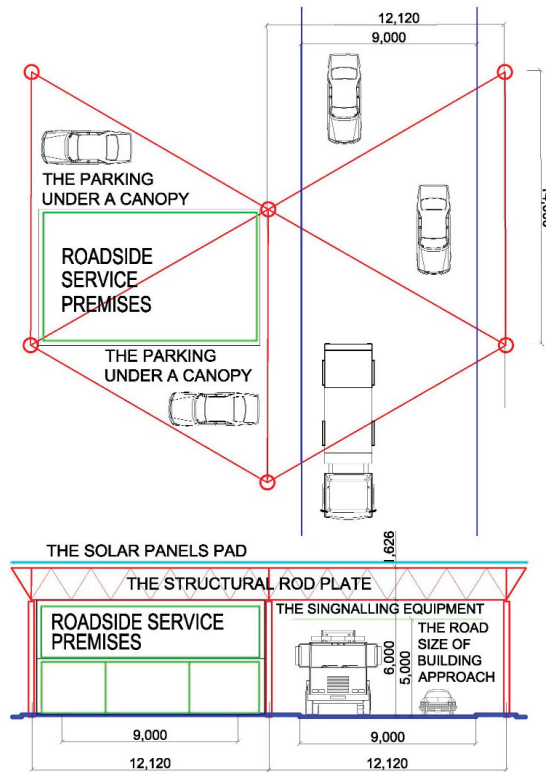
Module parameters: a plan, a section (Dimensions are given in mm).
